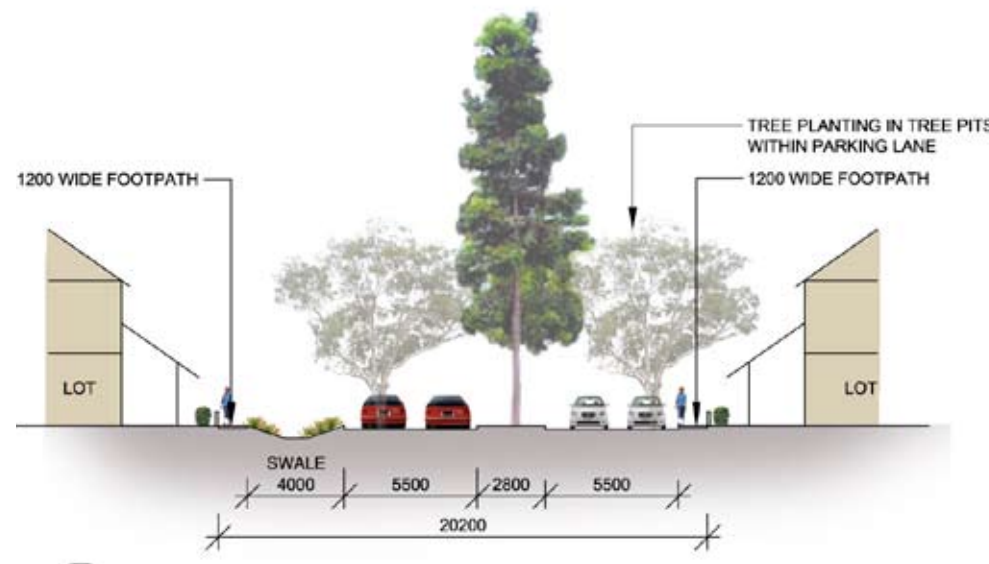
Identity planting at Cooper Road marking new primary local street with parking leading to park
